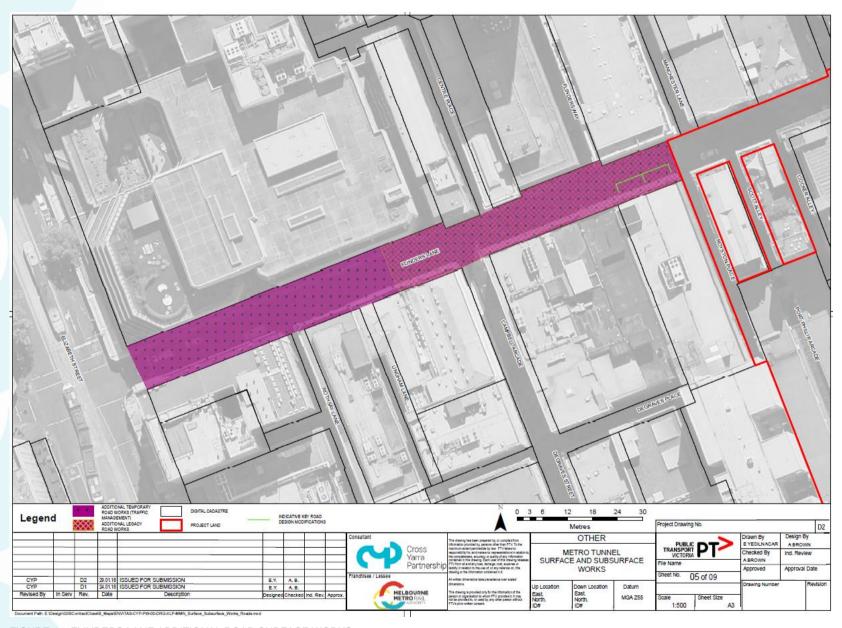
FLINDERS LANE ADDITIONAL ROAD SURFACE WORKS
